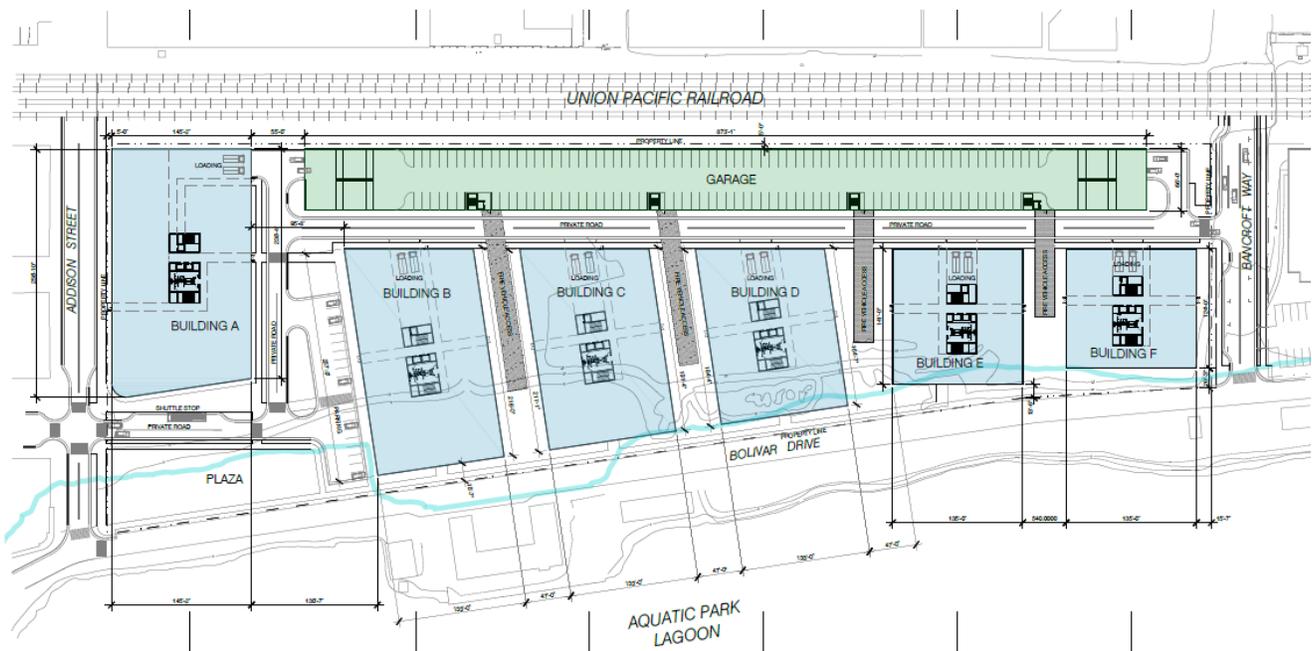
Conceptual Site Plan for Proposed Development Scheme 2
